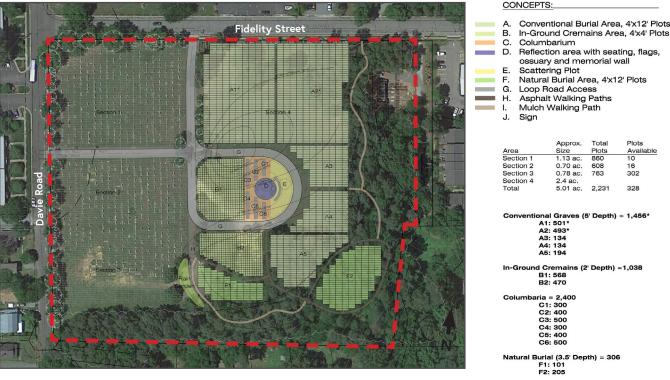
Concept Plan showing proposed grid and burial spaces. (CVDA)
